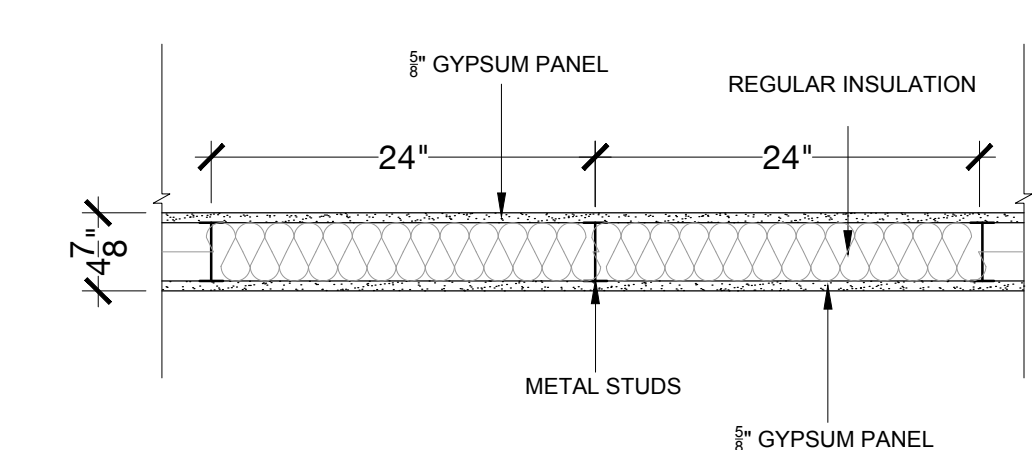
SUITE BUILD-OUT PARTITION WALL - METAL STUD SYSTEM
